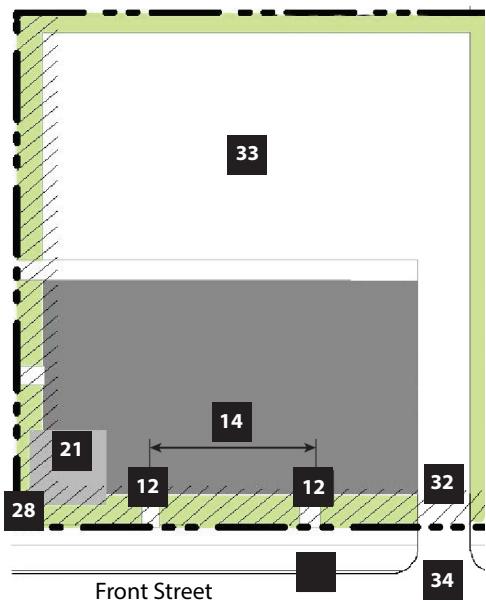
General building siting diagram shown with corner tower and rear vehicular access. Not to scale.
